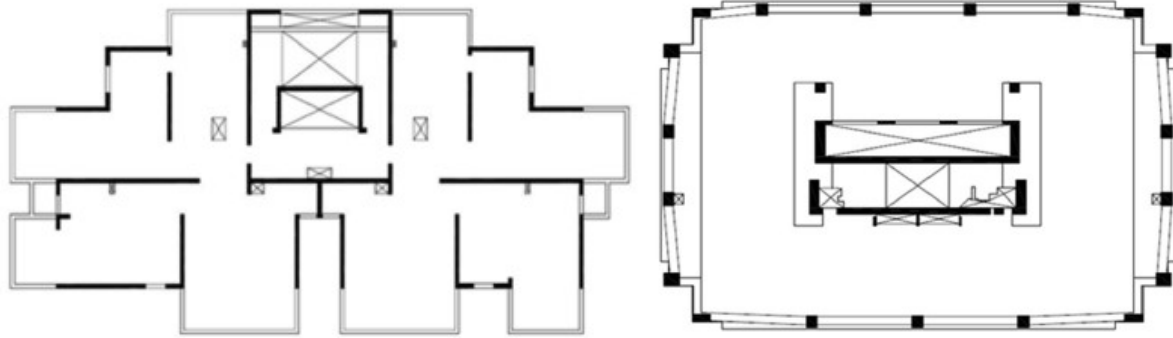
Typical residential (left) and office (right) floor plans in Chilean high rise RC buildings
